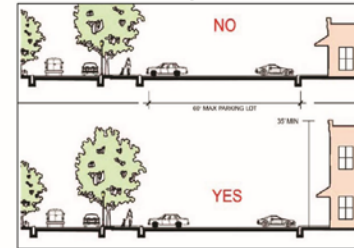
This image depicts how buildings in conventional areas may locate off-street parking in the area between the building's façade and the street it fronts, provided the building is three stories in height or greater.
